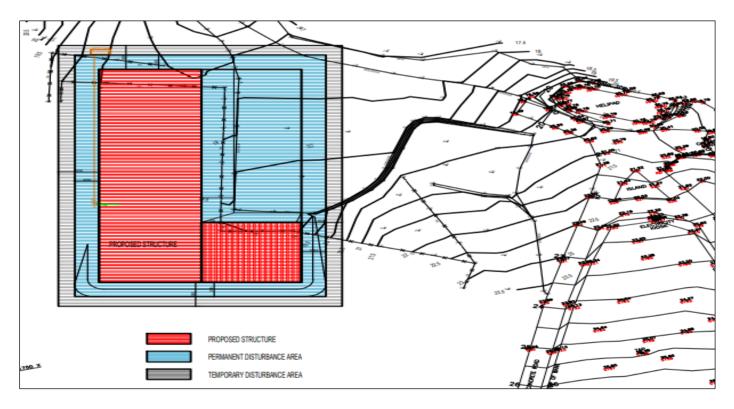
Location of proposed new garages relevant to the previously disturbed area (TMBA, 2024)
